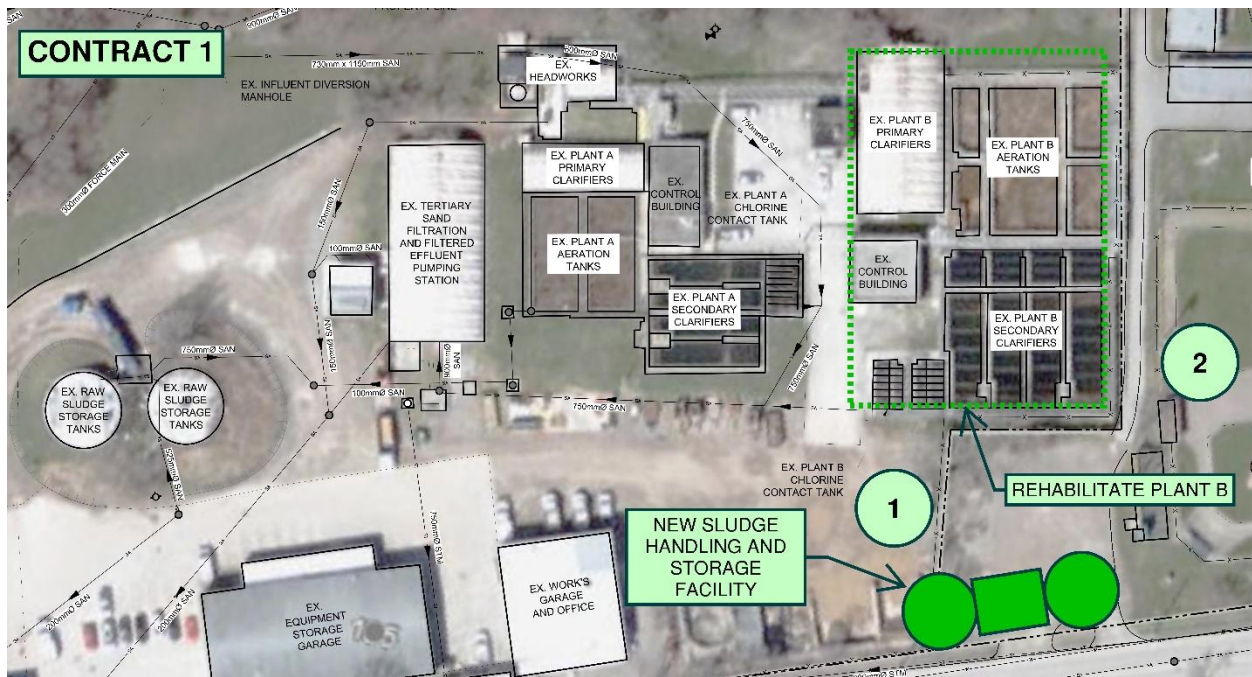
Site Layout B Implementation - Conceptual Contract 1
